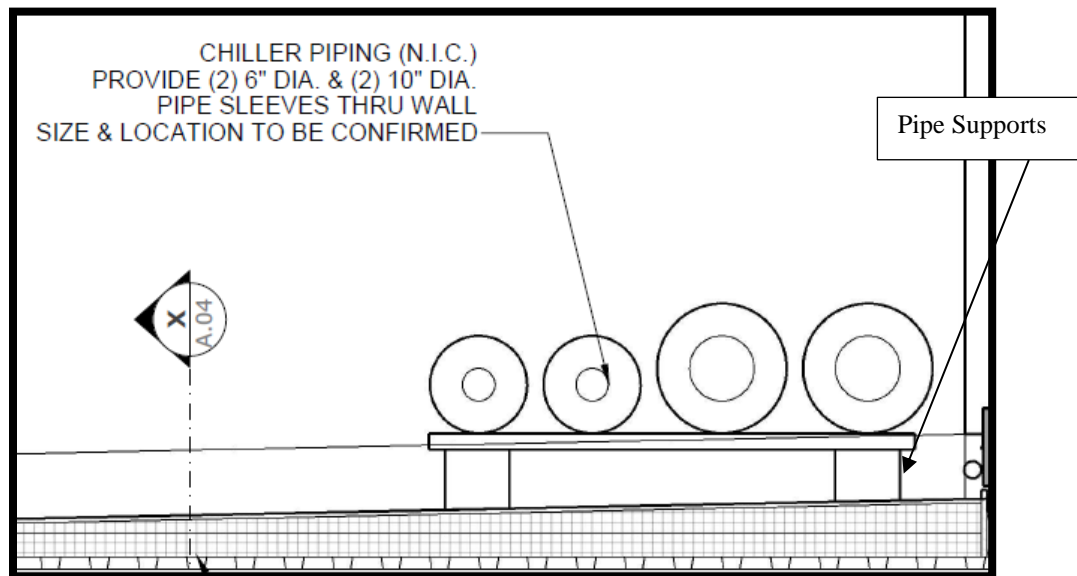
Pipe Supports Section View. (See A.07 Building/Wall Section)
